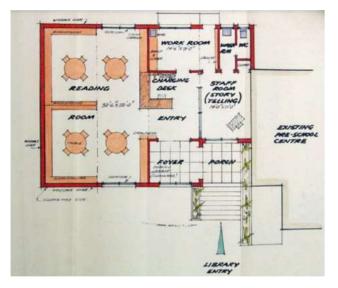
Sketch plan for the Children's Library prepared by local architectural designer David L Woodger in June 1960, showing existing pre-school building to the right. (Source: Public Building Plans File No.5841 Plan No.4057, Unit 413, VRPS 8044, PROV, cited in Mills and Westbrooke 2010: 15)
